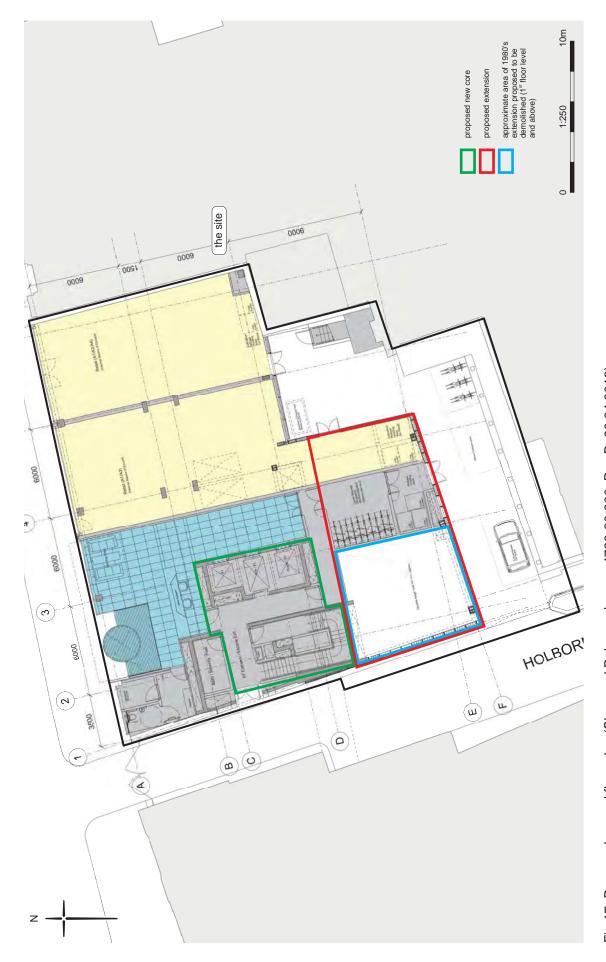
Proposed ground floor plan (Sheppard Robson, dwg no. 4728-20-200, Rev B, 30.04.2013)
